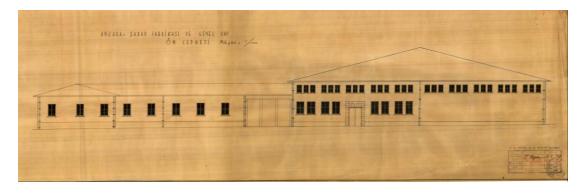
The original drawing of the wine and whiskey production building, the south elevation, scale 1/100, Construction Section in General Directorate of TEKEL, 17.03.1947 (Source: TTA Archive)
